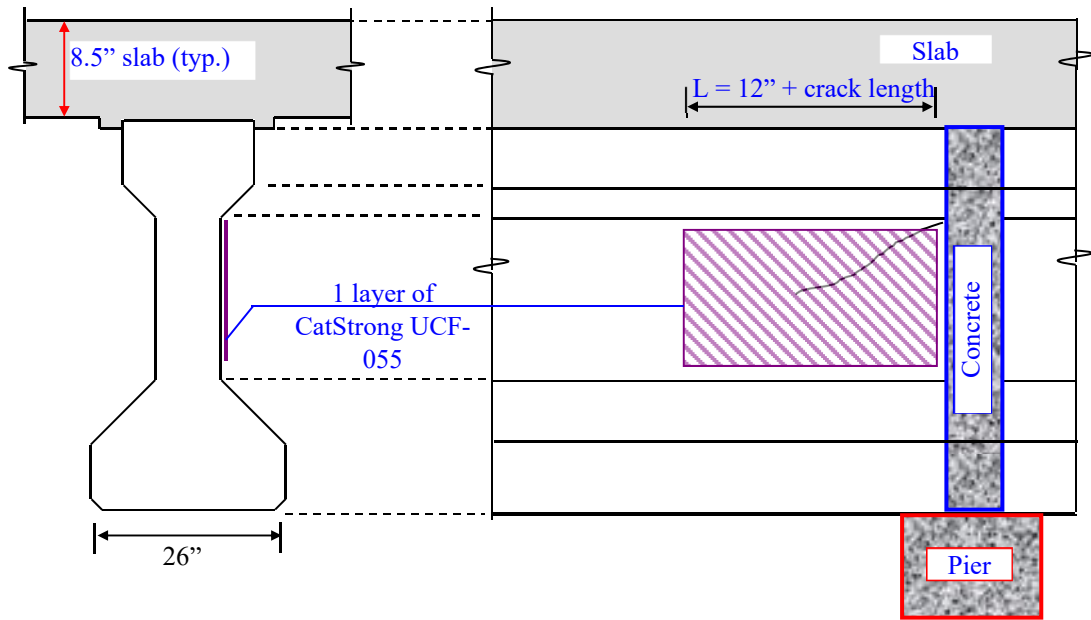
Typical placement of CatStrong fabric on KY 11 over CSX Railroad and Strodes Run
